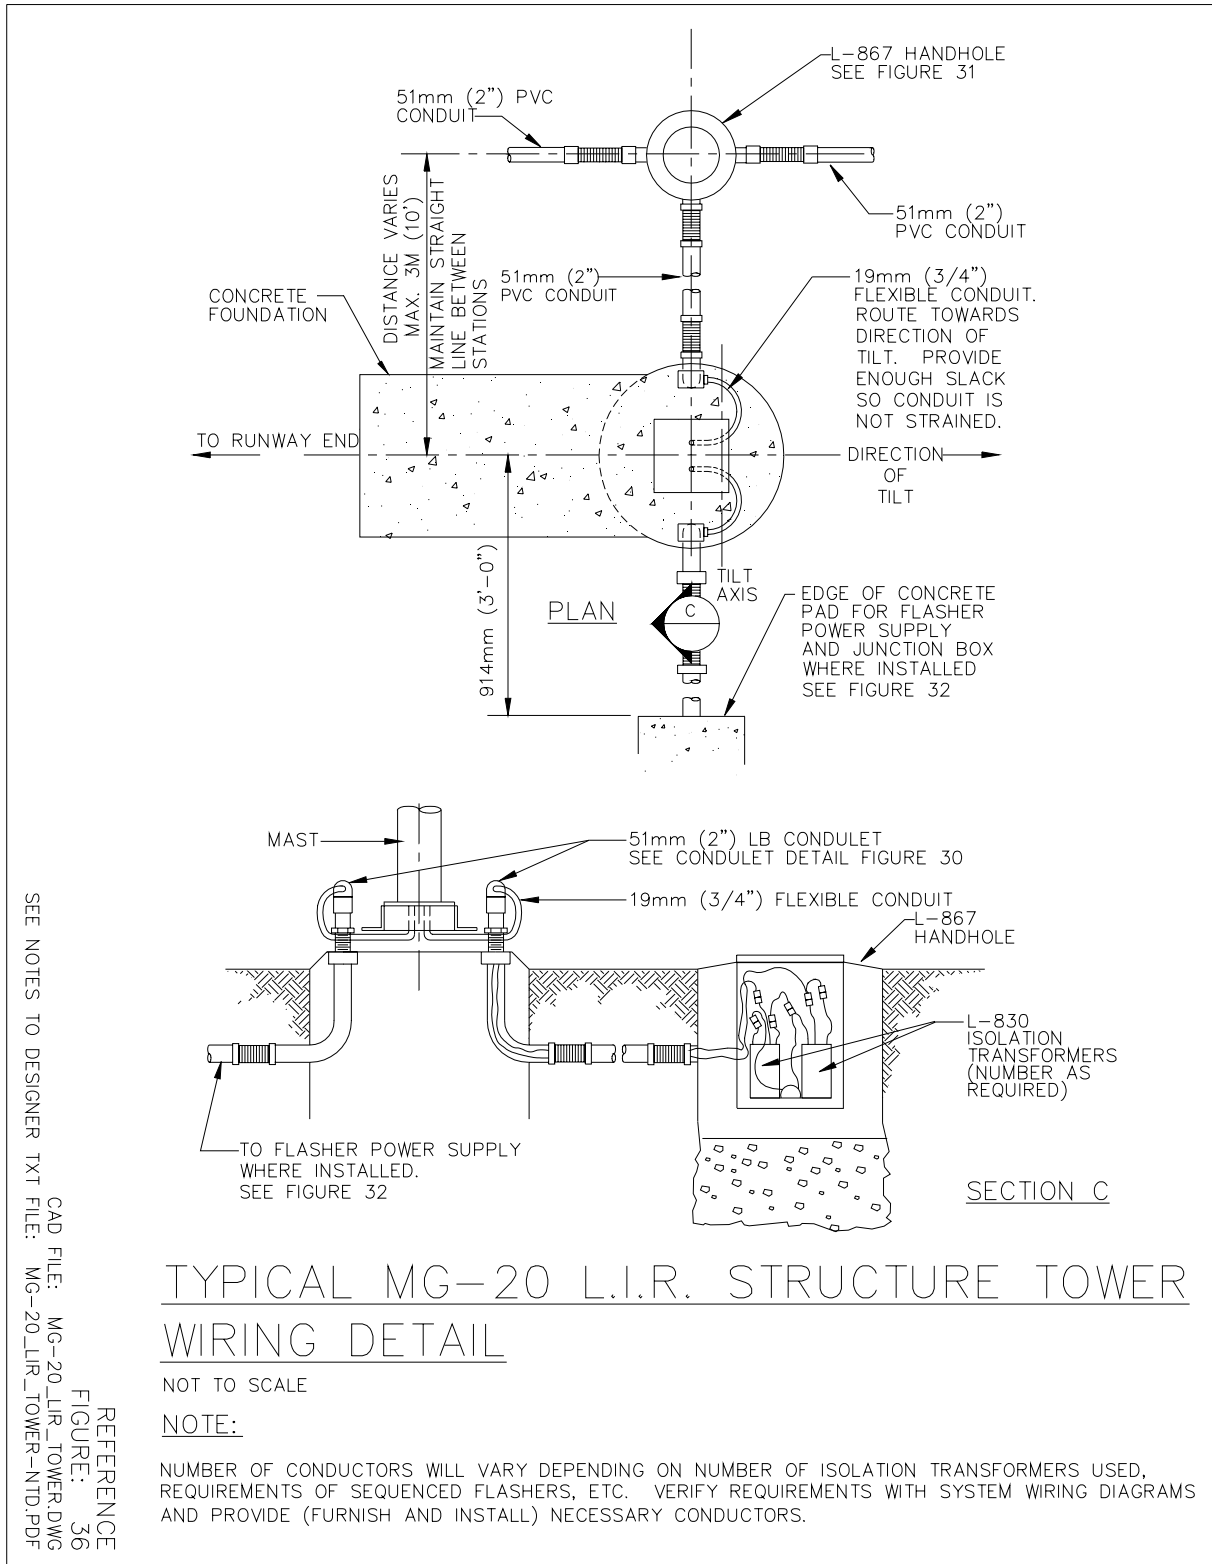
Typical MG-20 L.I.R. Structure Tower Wiring Detail
